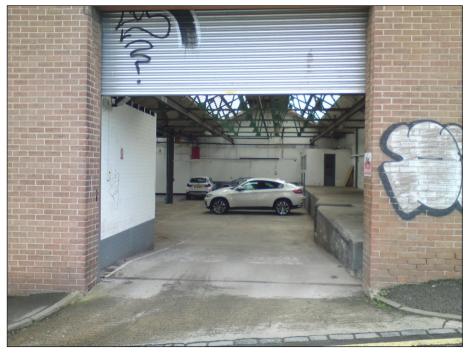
Doorway with roller shutter within the west end of the front elevation of Building $10\,$
